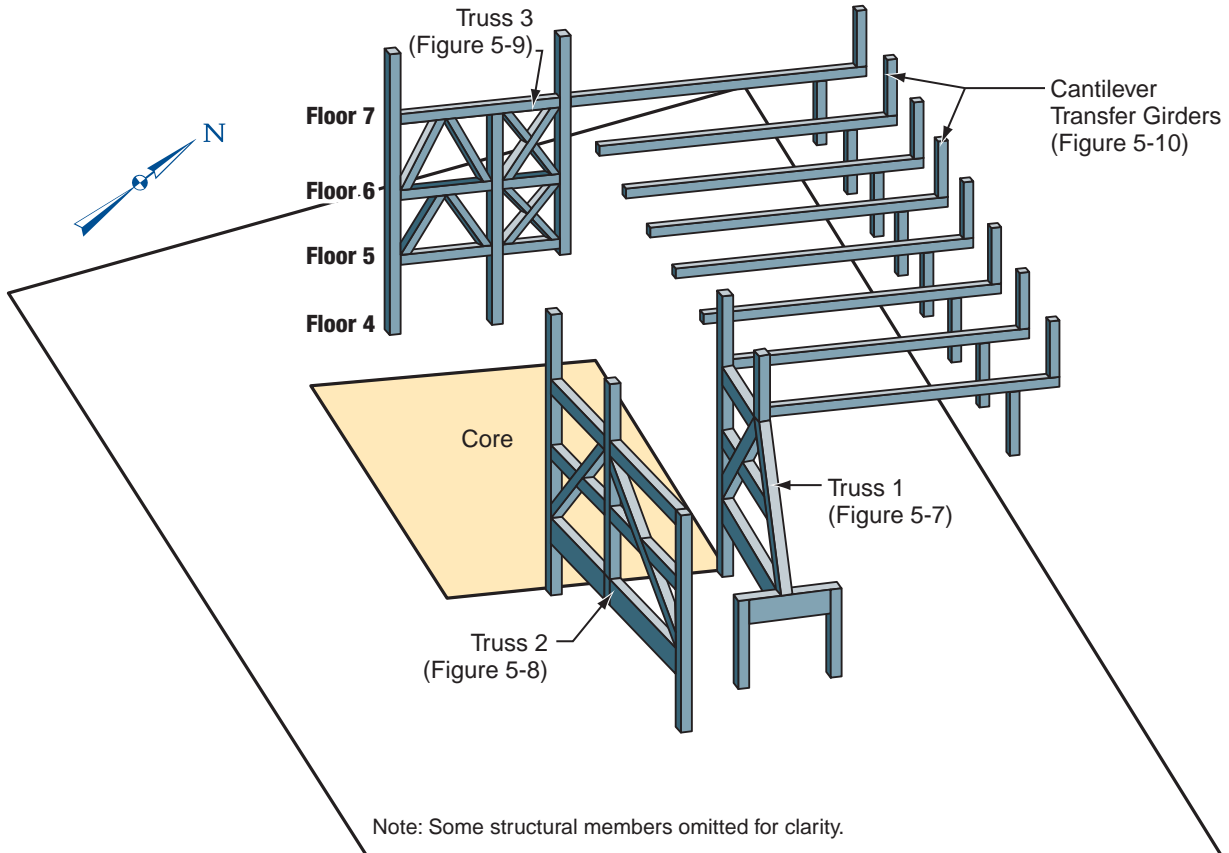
3-D diagram showing relation of trusses and transfer girders.
